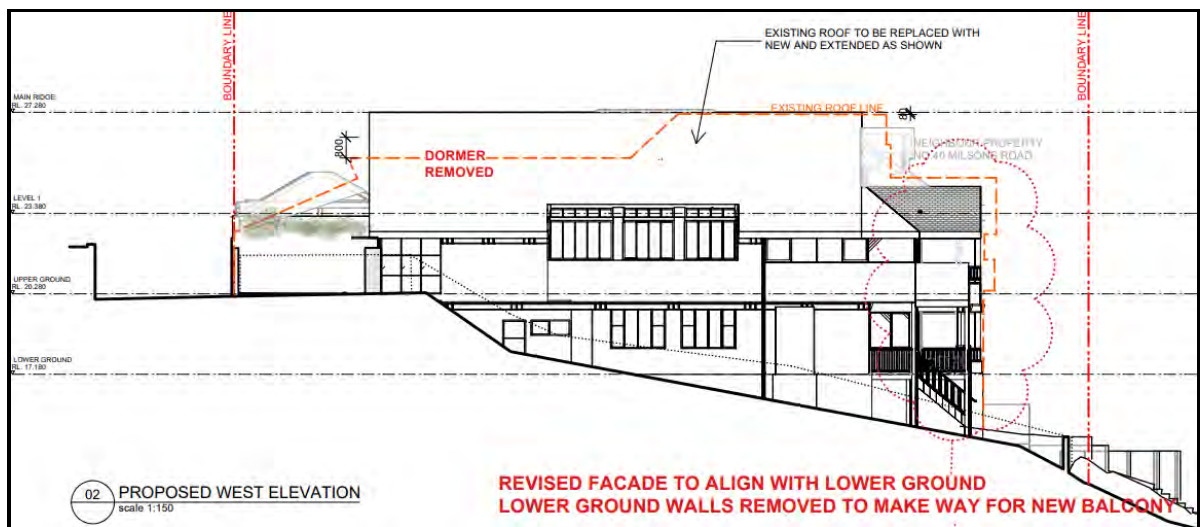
Proposed West Elevation, DA-A-202 Rev L
